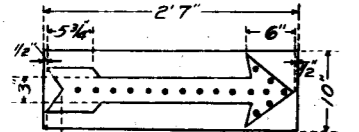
DETAILS OF ROAD UNDER CONSTRUCTION SIGN
